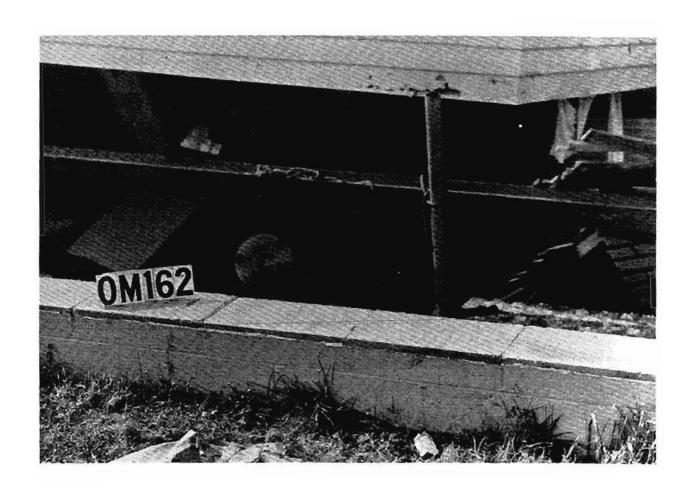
PARTIALLY BURIED CONCRETE BLOCK PERIMETER FOUNDATIONS ARE TRADITIONAL IN OMAHA, NEBRASKA. The Omaha Tornado of May 6, 1975 pushed many houses off the perimeter walls.
